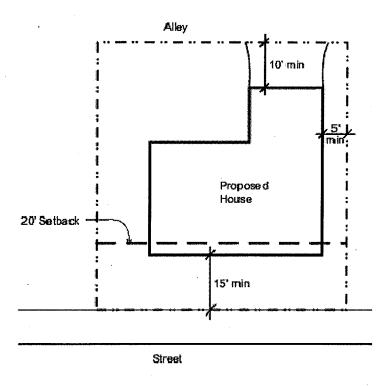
Figure Exception to 20.50.070(2): Minimum front yard setback may be reduced to 15 feet if there is no curb cut or driveway on the street and vehicle access is from another street or alley.
